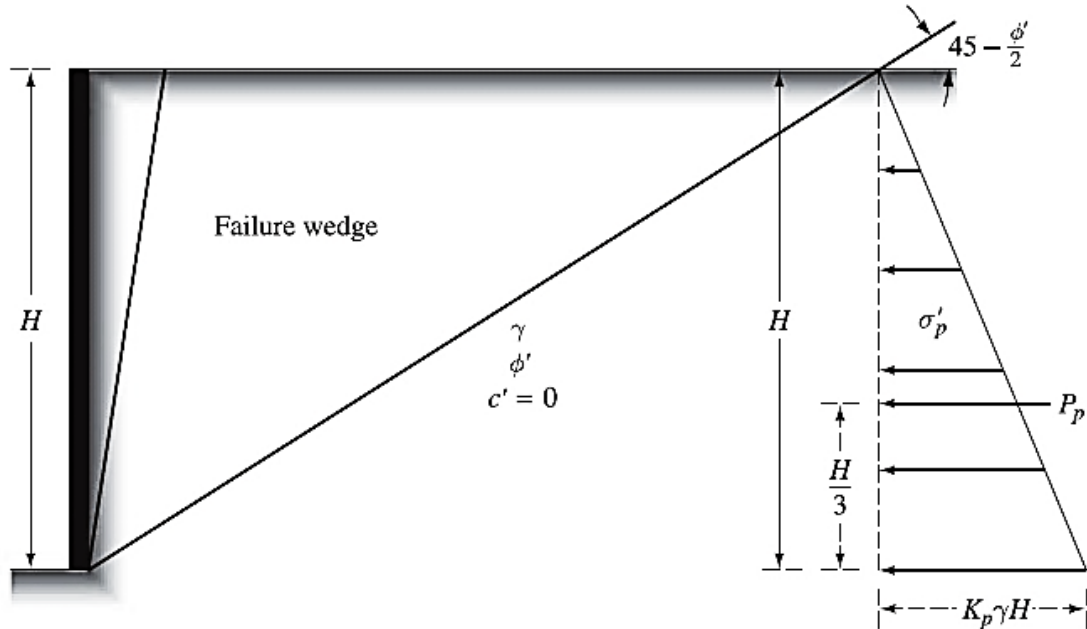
Pressure distribution against a retaining wall for cohesionless soil backfill with horizontal ground surface (After Braja M. Das "Fundamentals of Geotechnical Engineering")
